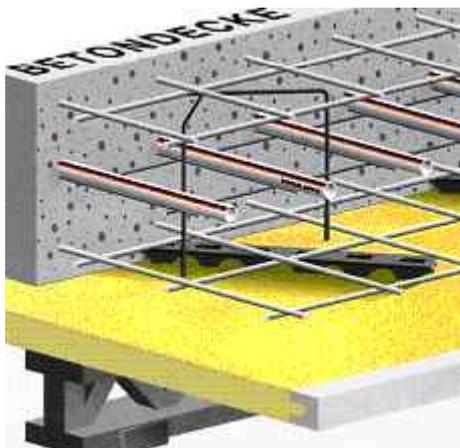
cross-section of the on-site constructed system (www.velta.de)
